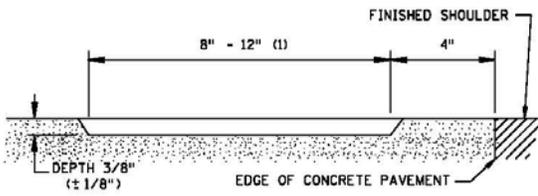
CONCRETE PAVEMENT OPTION B - CONCRETE RUMBLE STRIPE
